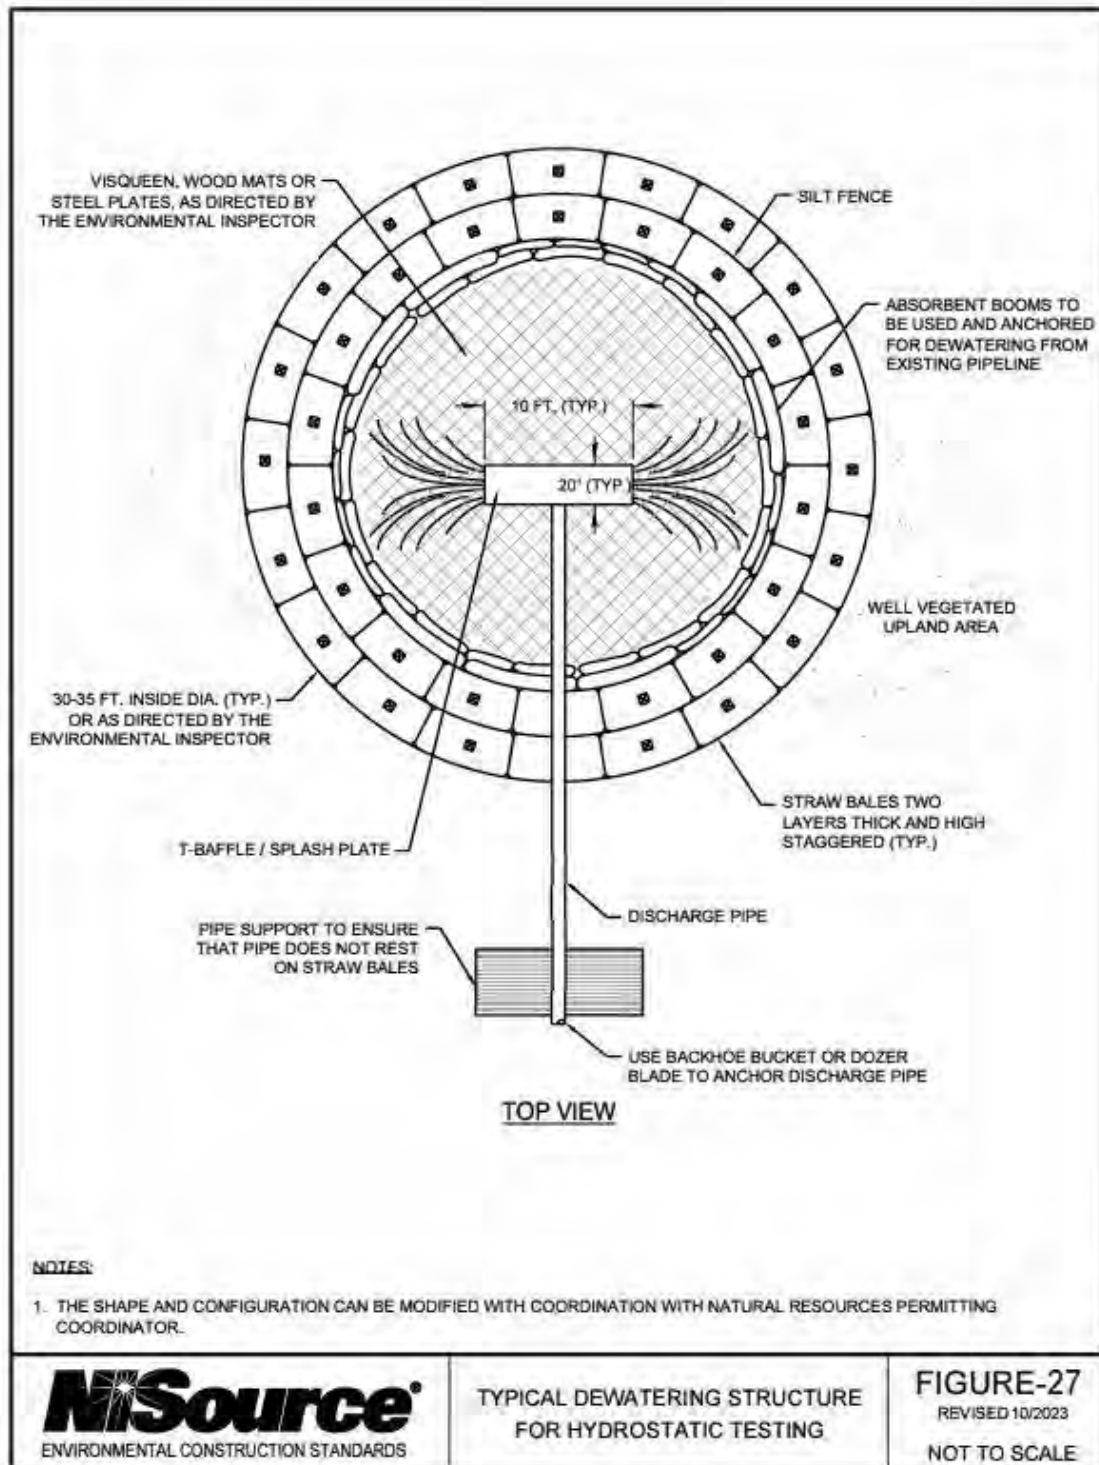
Typical Dewatering Structure for Hydrostatic Testing
